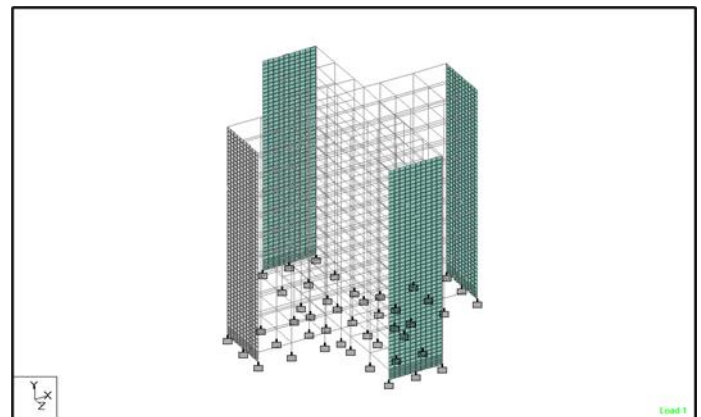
3D model of the structure with shear wall at edges (Model 1)
